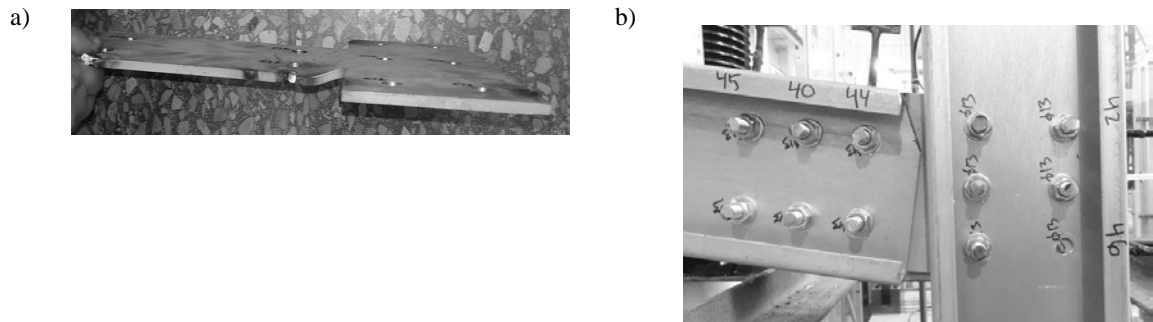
Failure modes: (a) flexural failure of gusset plate; (b) column bolts in shear and column sections in bearing.
